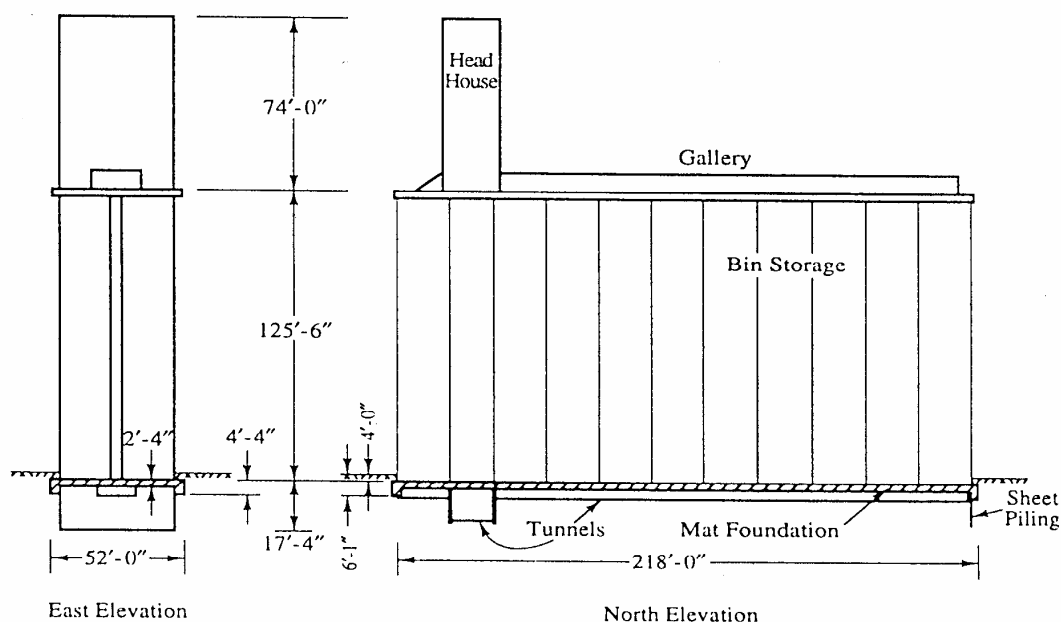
Elevation views of the elevator (Nordlund and Deere, 1970; Reprinted by permission of ASCE).
